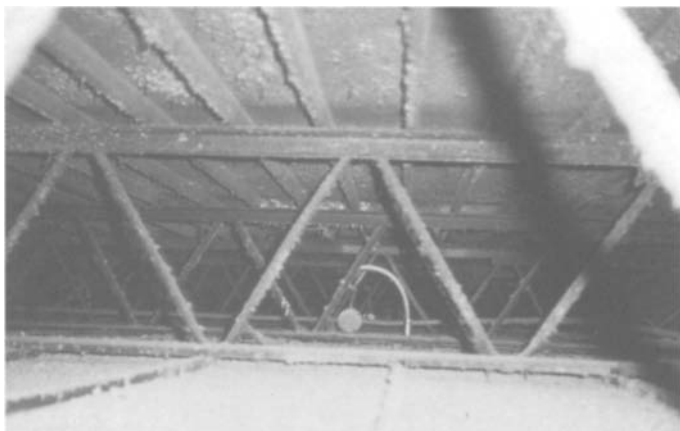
Overspray from ceiling plaster on joists and deck in plenum.
